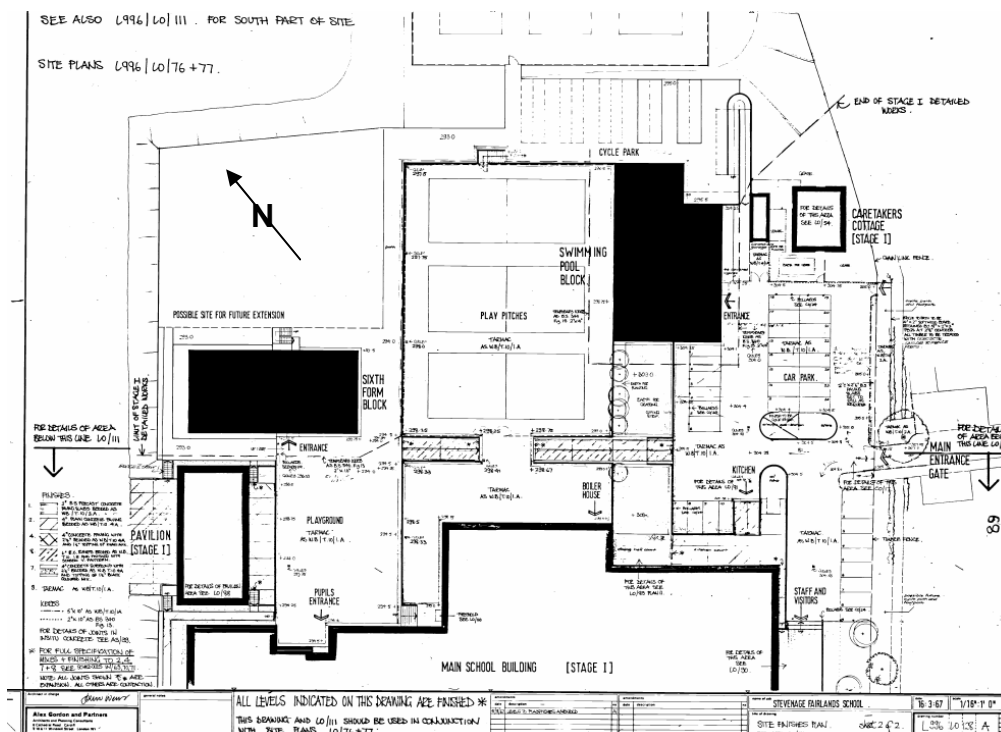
Architect's plan of original school layout (1967), showing 6th form block, swimming pool and pavilion to north of school. Plan ref.: L996.LO.28.A
